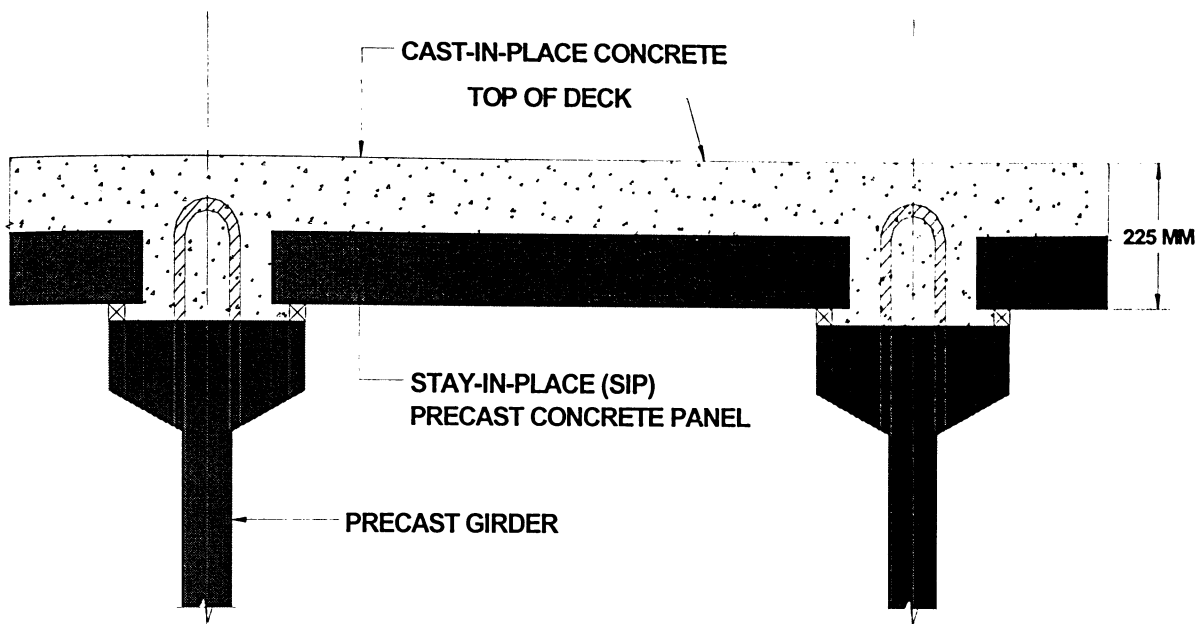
Partial-depth Prefabricated Bridge Deck Panels System
